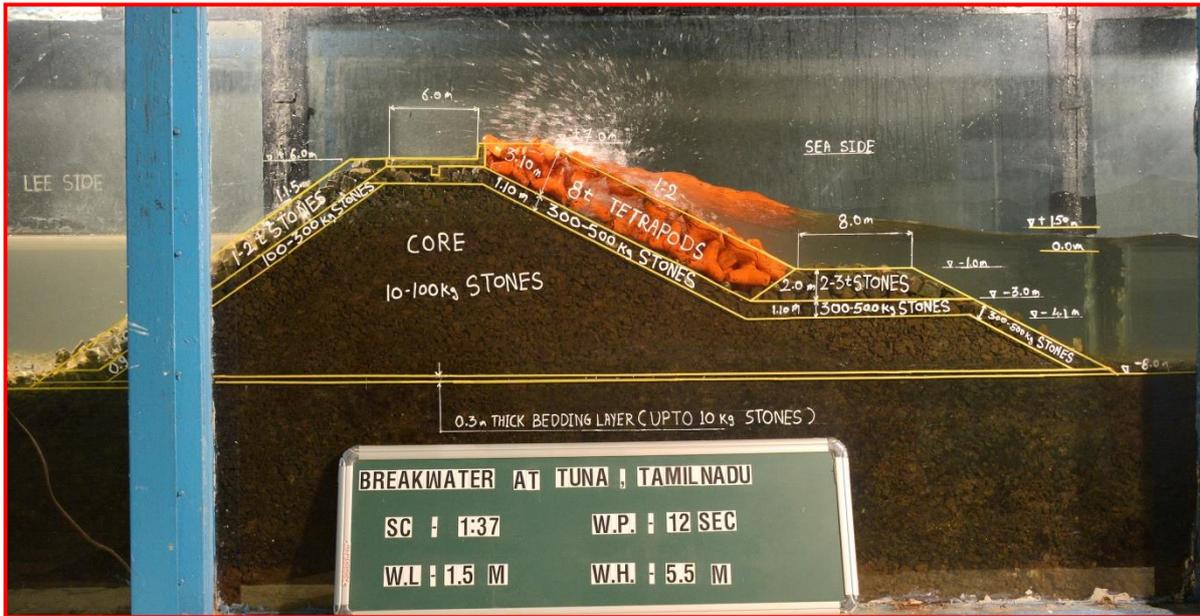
Wave action on armour layer of breakwater consisting of 8 t tetrapods at -8.0 m bed level with +1.5 m water level and 5.5 m wave height
